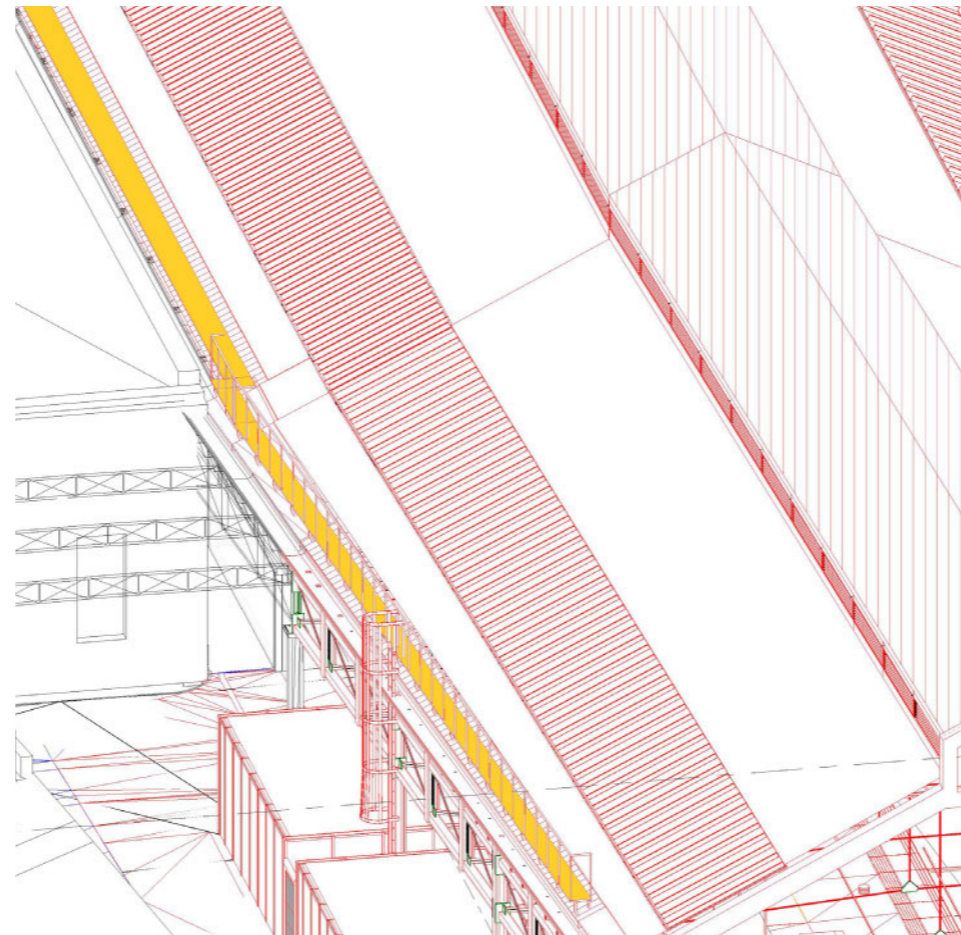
highlighted access walkway on roof A extension with emergency ladder
